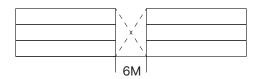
A 2:1 ratio where the street wall is twice the width of the street.
